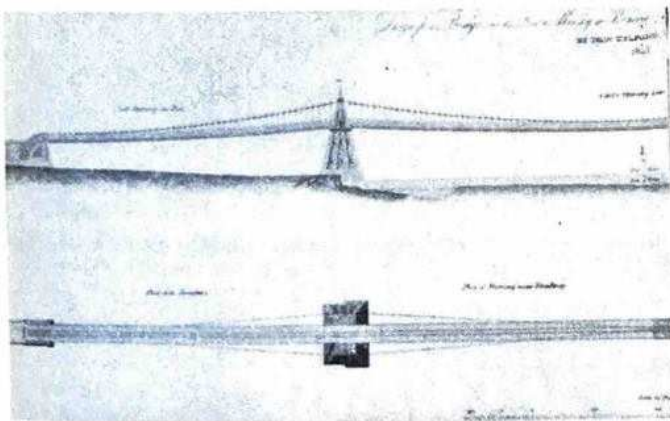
Runcorn Bridge proposal 1814 – Elevation from mid-span to south abutment. [32].
